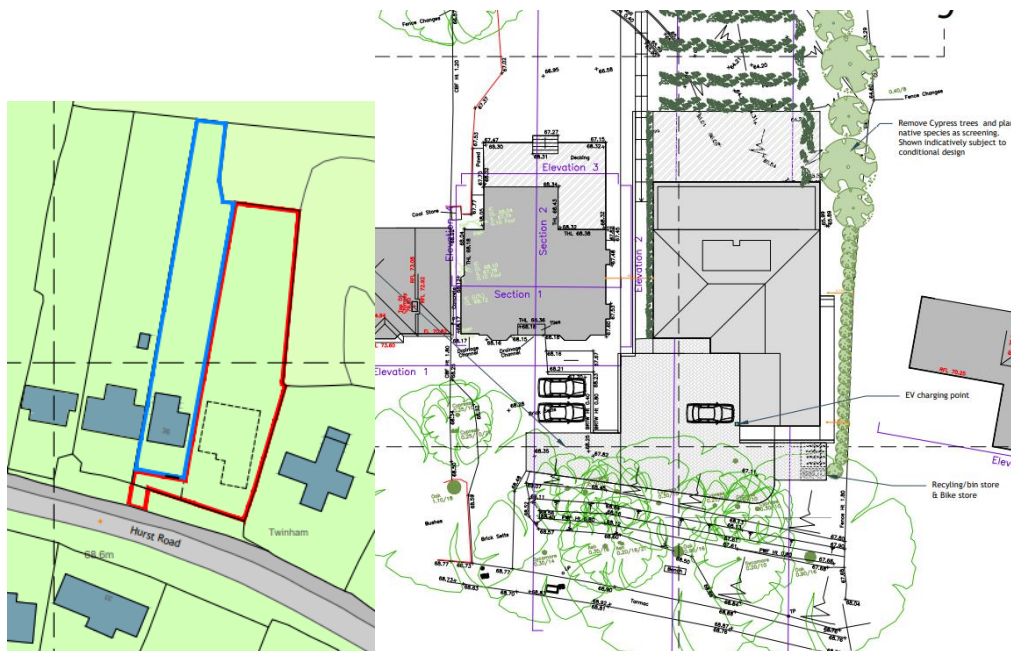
Approved Location Plan and Site Layout Plan (ref: DM/23/2126)
